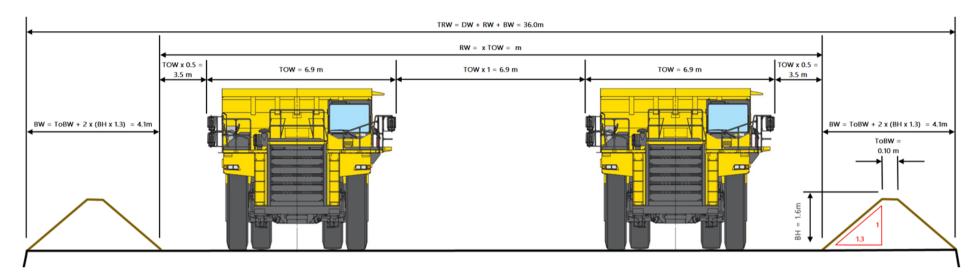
Dual-Lane Ex-Pit Road Layout
